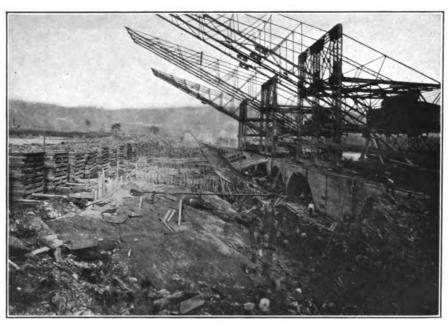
Fig. C.—McCalls Ferry dam, showing cantilever cranes for handling materials.
